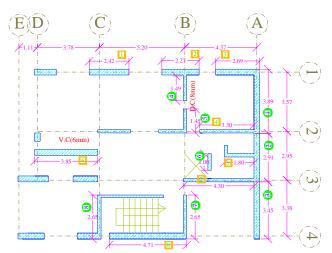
Plan of the ground floor of the sample building, and the observed wall damages
